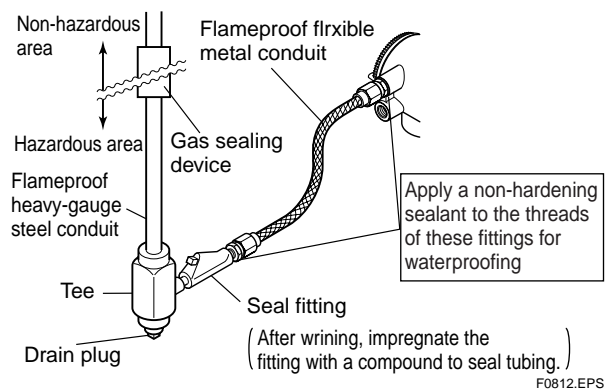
Typical Wiring Using Flameproof Metal Conduit
